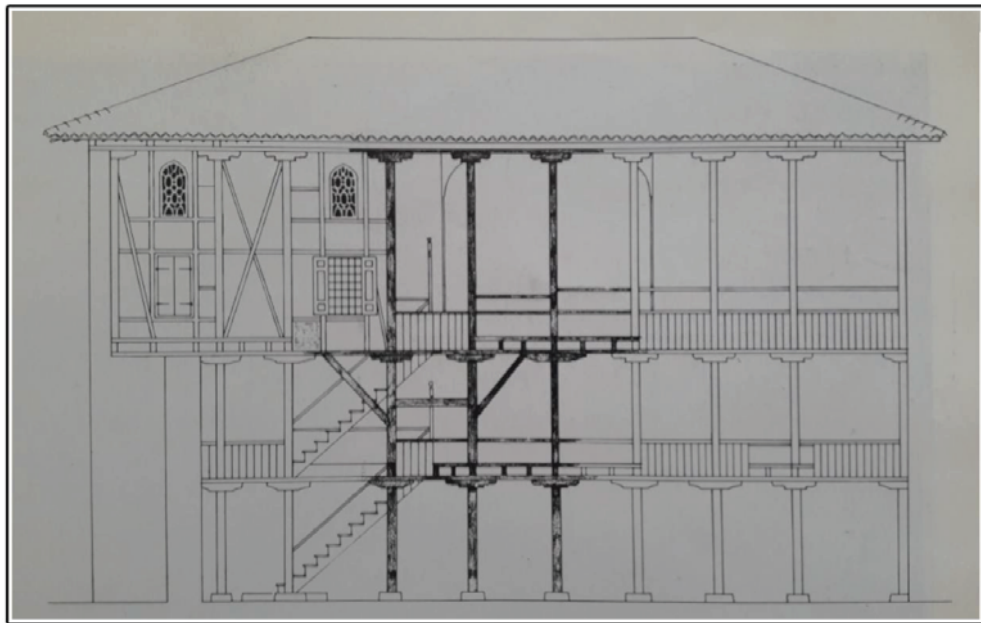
Section of Muradiye House. (Source: Eldem 1984, p.101)
